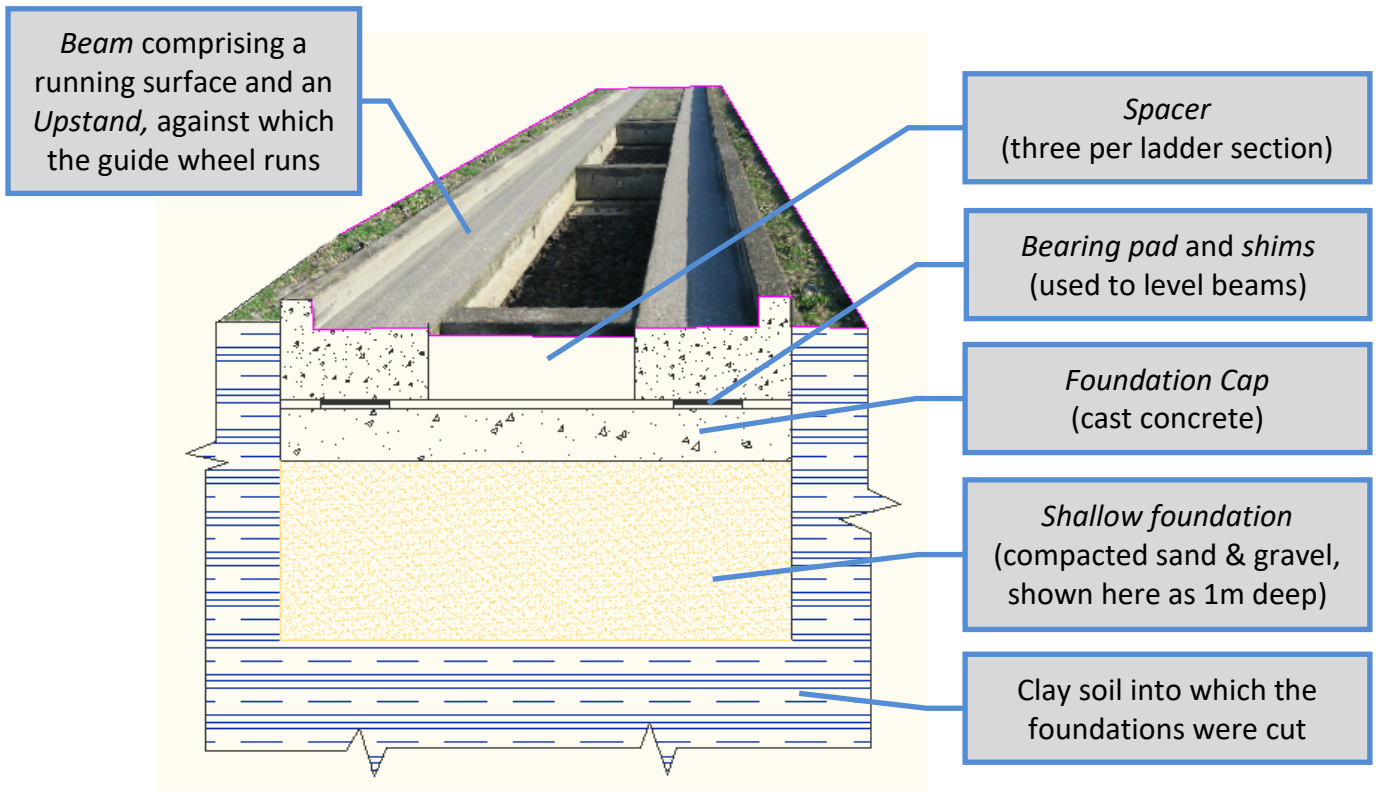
Cross-section of the busway showing a typical 15m 'ladder section' and one of three shallow foundations.
